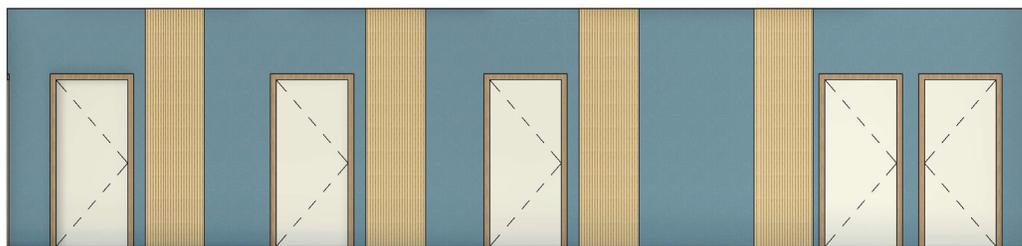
EMDR Therapy Office Hall - Elevation [NTS]
